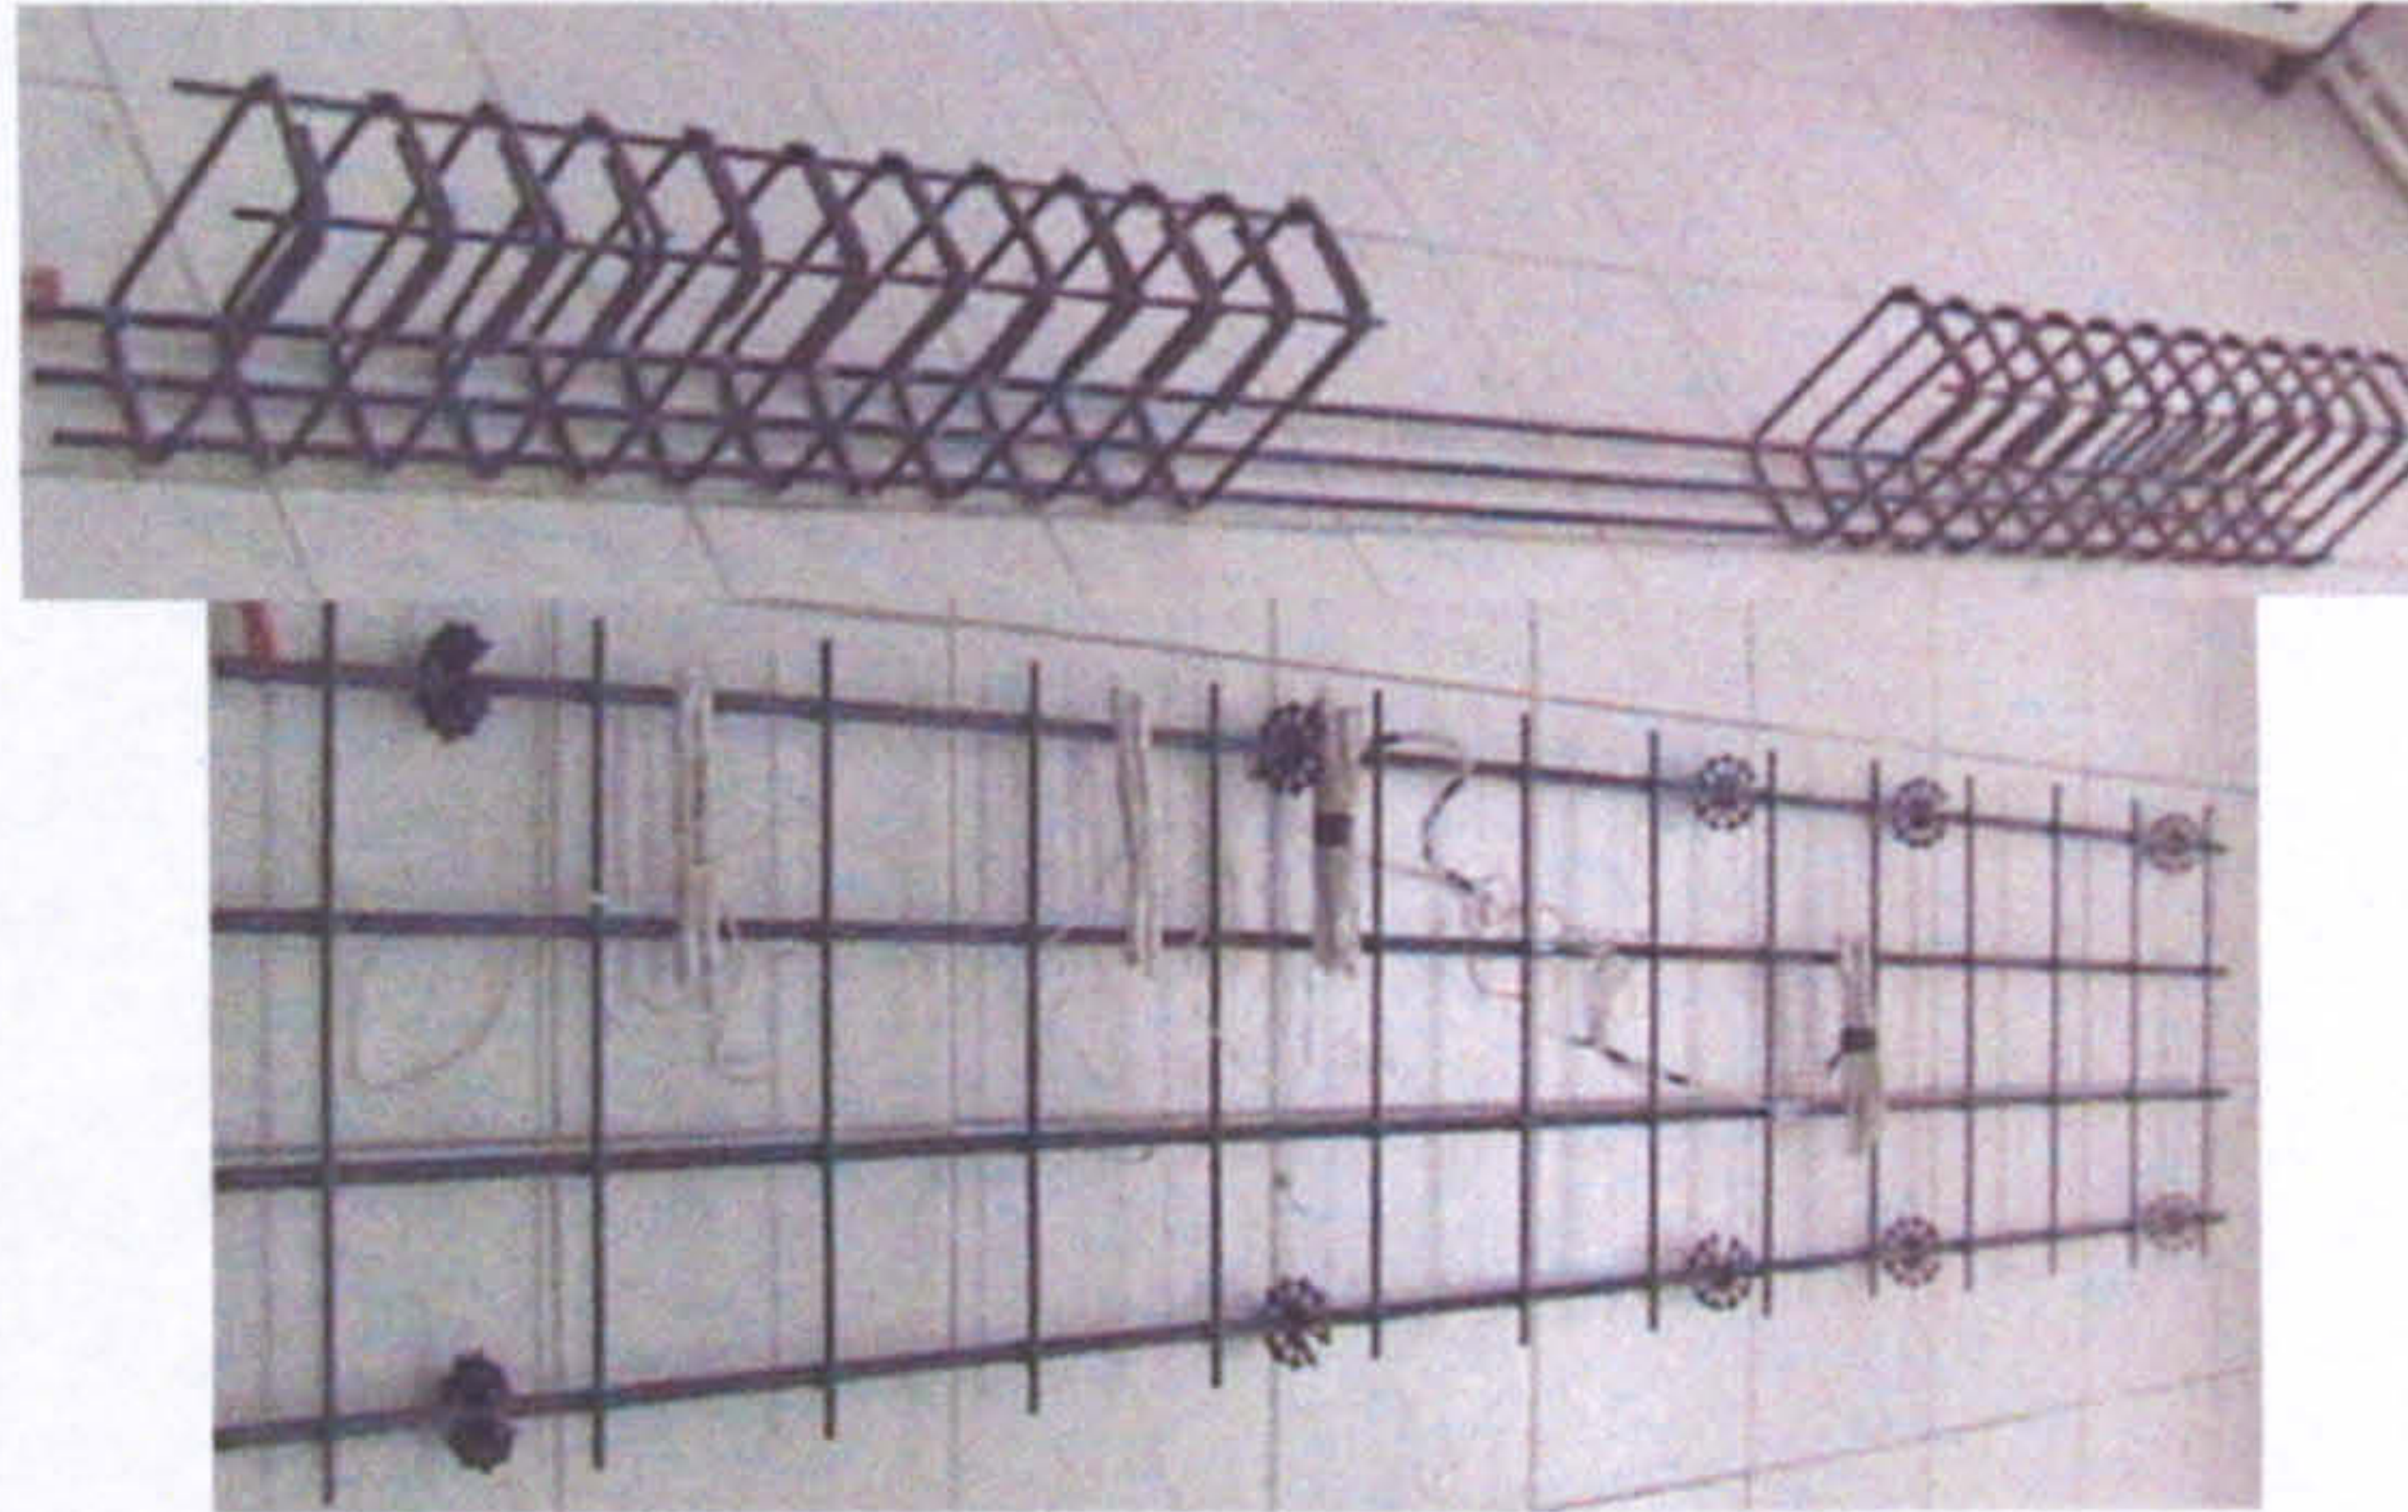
FRP reinforcement beam cage and slab mesh.
